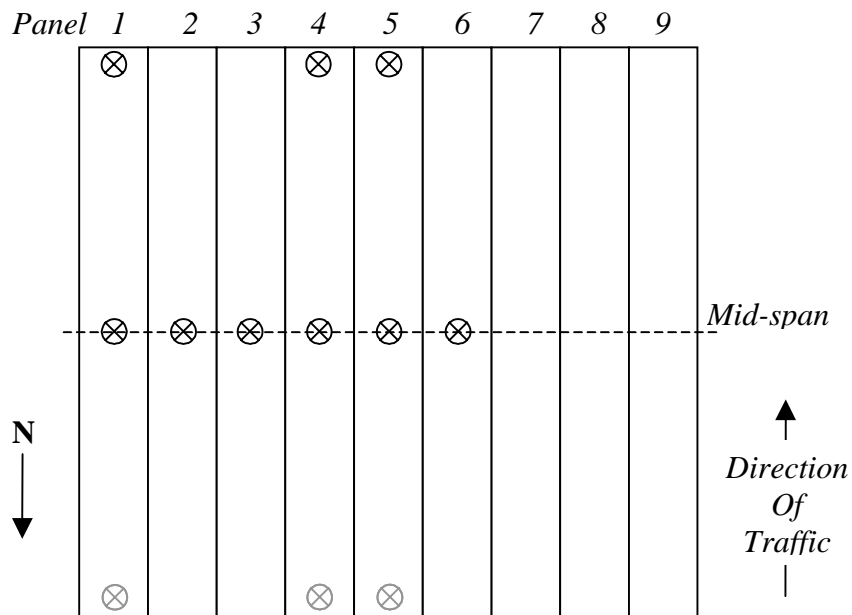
Layout of the DCVT Transducers – Walters Street
